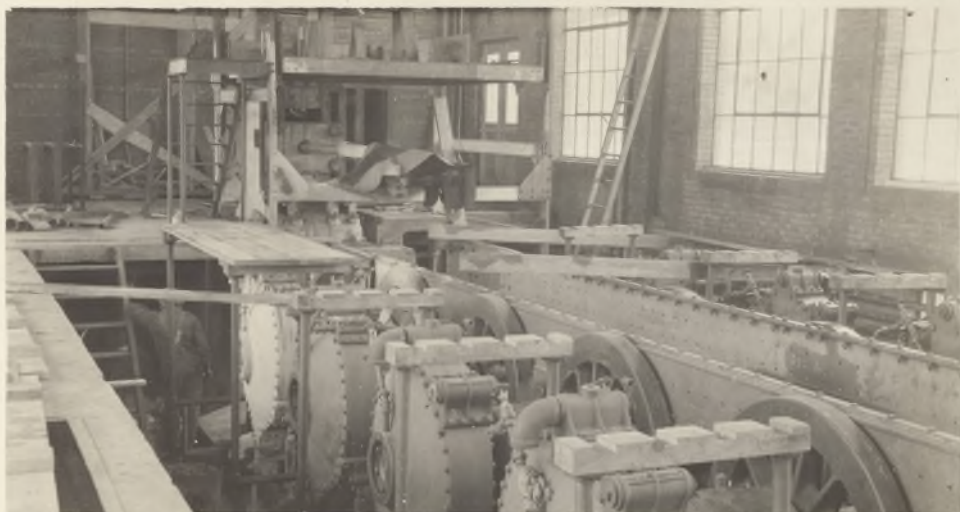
Supporting Mechanism Complete, showing Wheels, Brakes, and the Removable Track in place.
